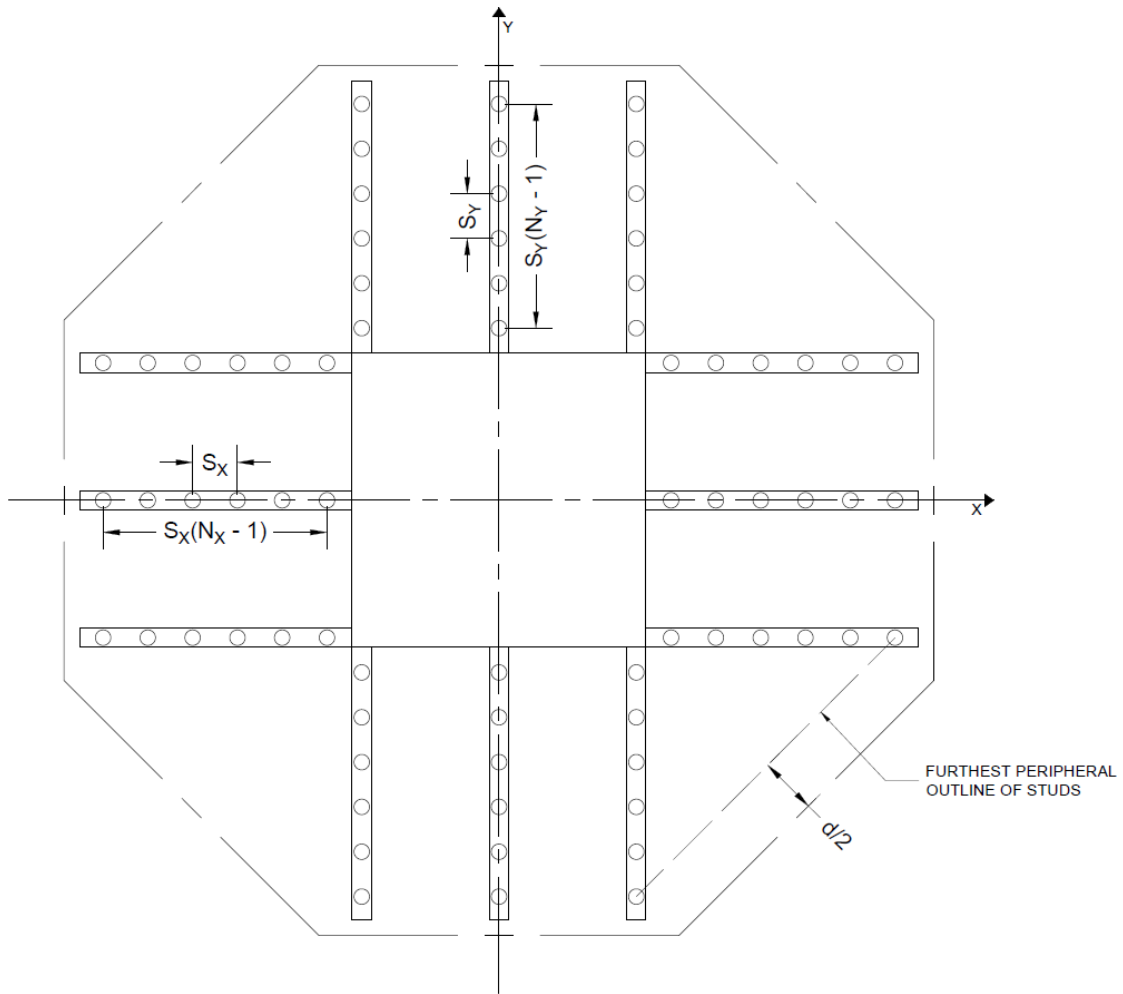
TYPICAL MORSE STEEL STUD RAIL SYSTEM DETAILS
